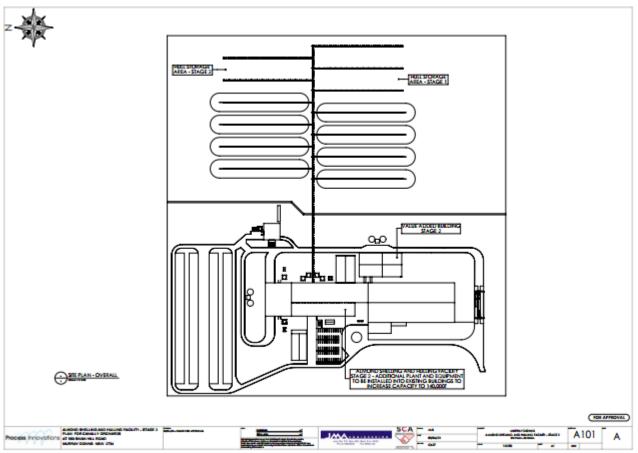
Proposed development Site Plan (JMA Engineering, 2024)
